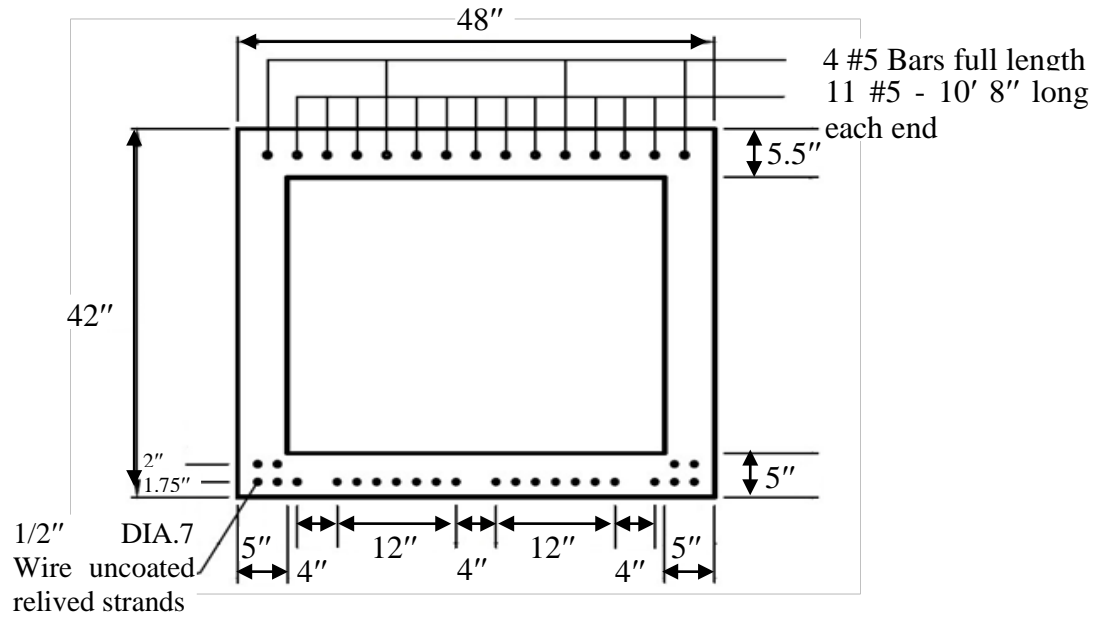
Cross-section of PSBB in FEA Bridge.
